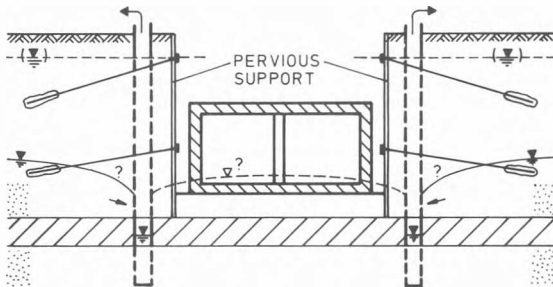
Dewatering for Subway Construction Near a Shallow Layer of Impervious Soil
